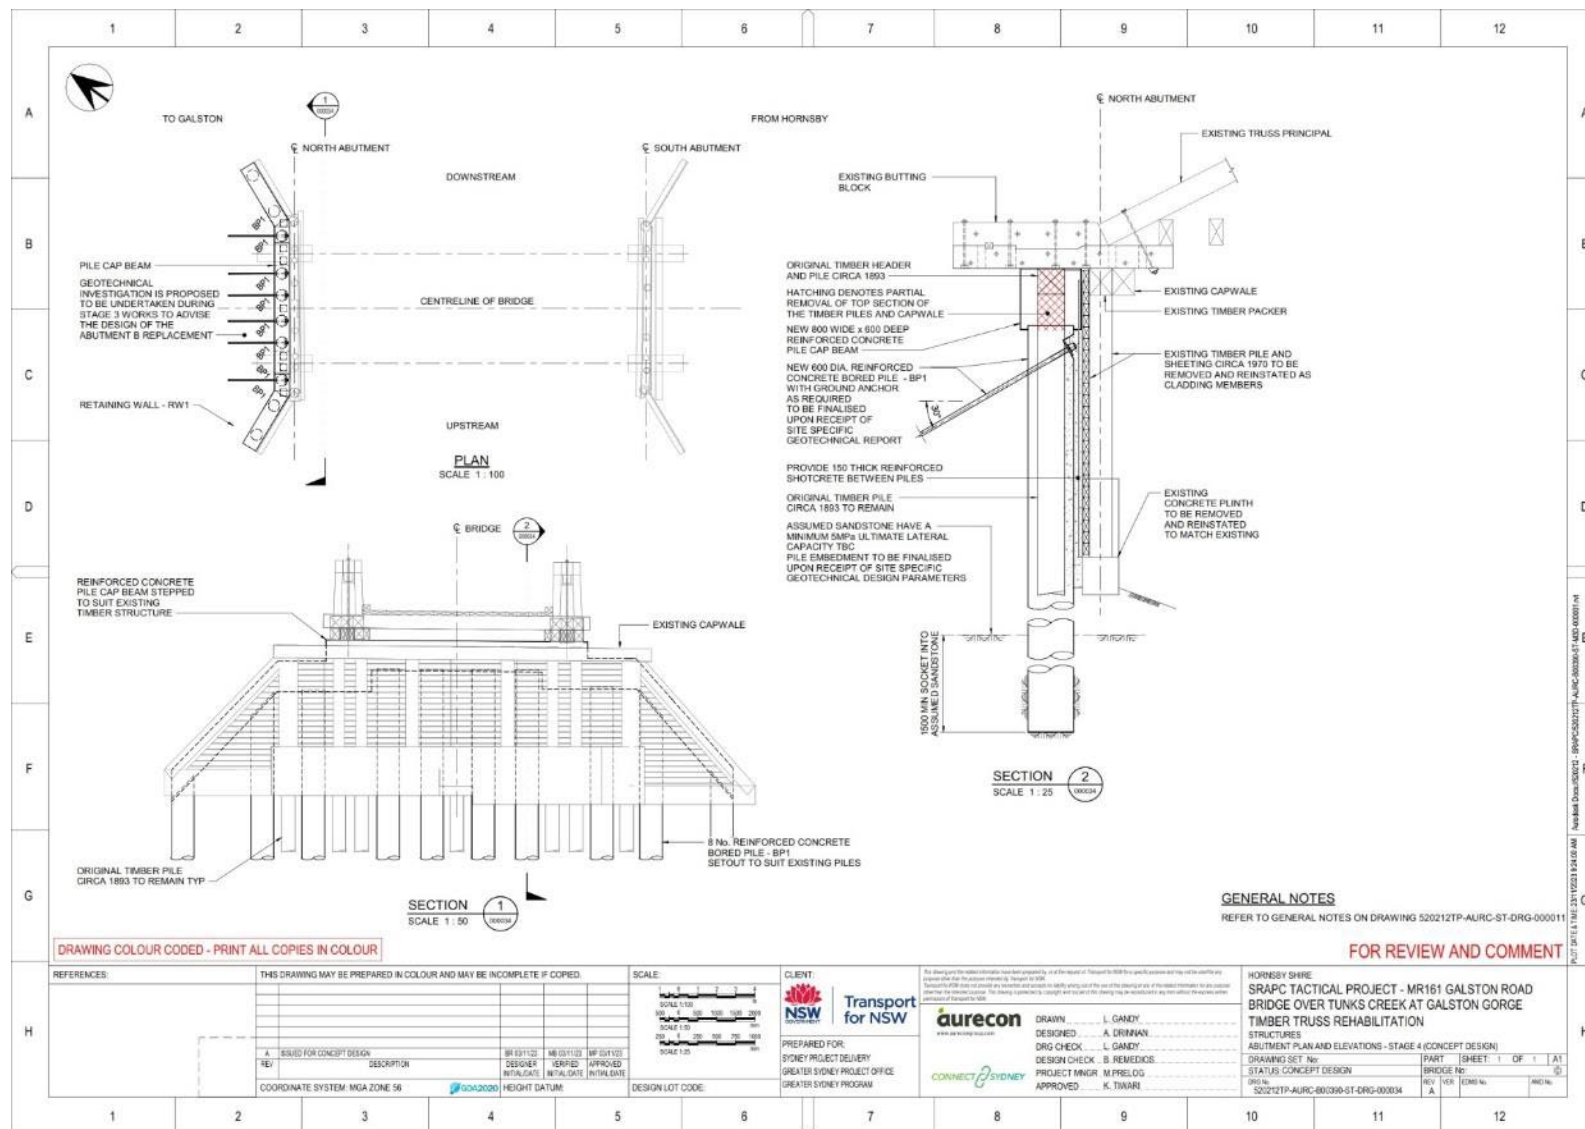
Structures abutment plan and elevations – Stage 4 (Concept Design): 520212TP-AURC-B00390-ST-DRG-000034 (Source: Aurecon)
